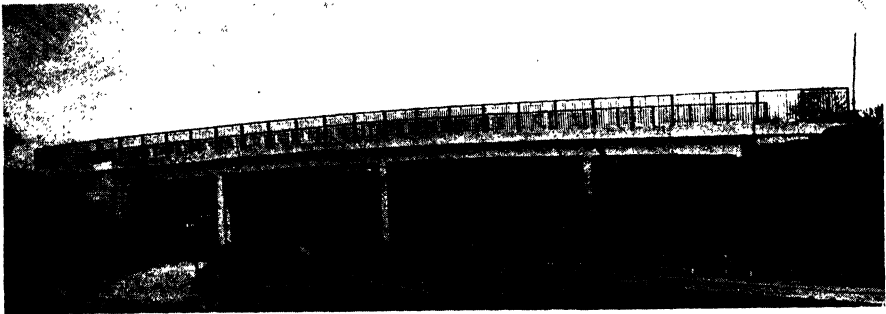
BRIDGE ON THE CATERHAM BY-PASS ROAD, SURREY.
